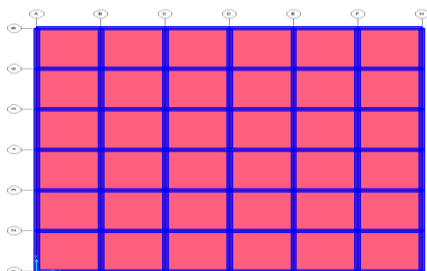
Plan view of model-2 15-storey normal building with TMD normal building with TMD
